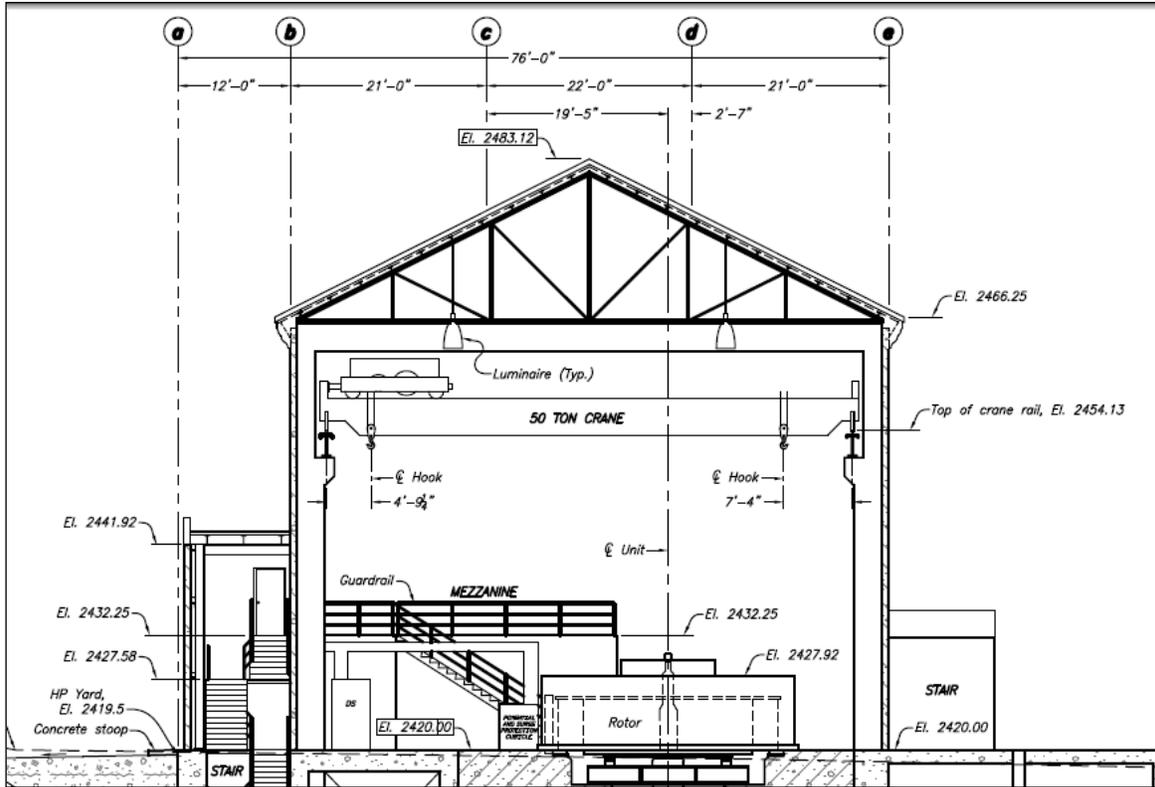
Transverse section of powerplant with moment frame and separate steel truss roof support system.
